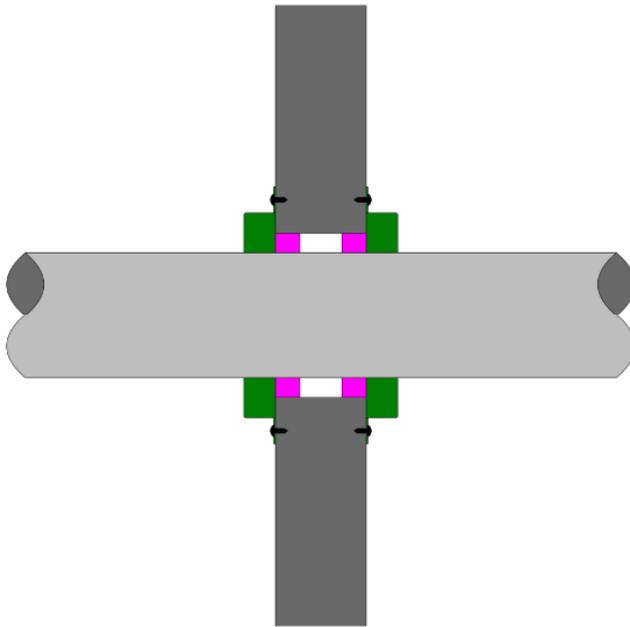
Typical installation of pipes fitted perpendicular to wall system with BOSS MaxiCollar™ installed on both faces
